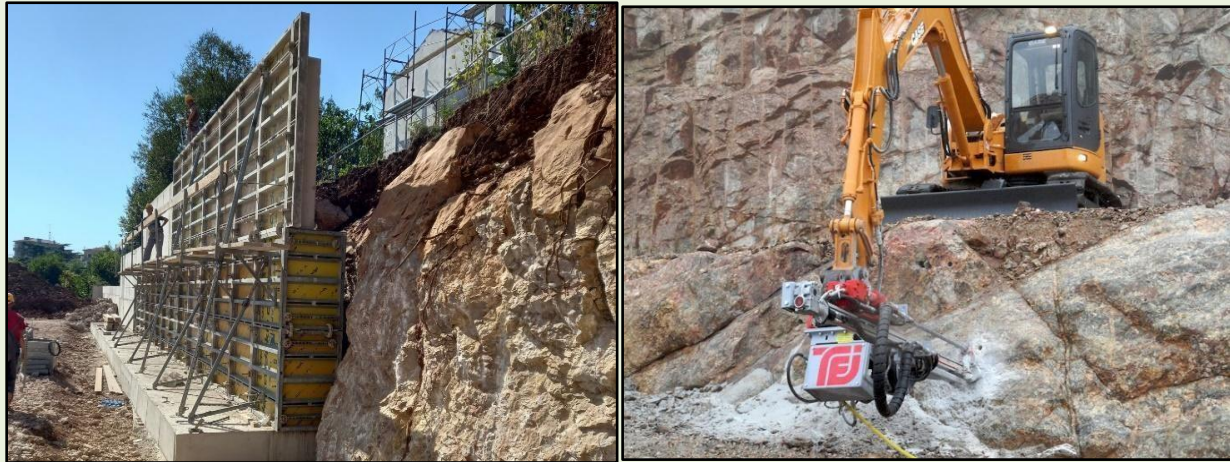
Slope Stabilization Techniques – Construction of a Retaining Wall (left) and Application of Soil Nailing (right) for Slope Reinforcement.
